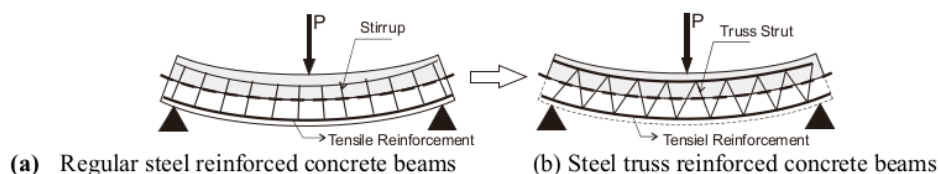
Regular reinforcement system vs steel truss reinforcement
